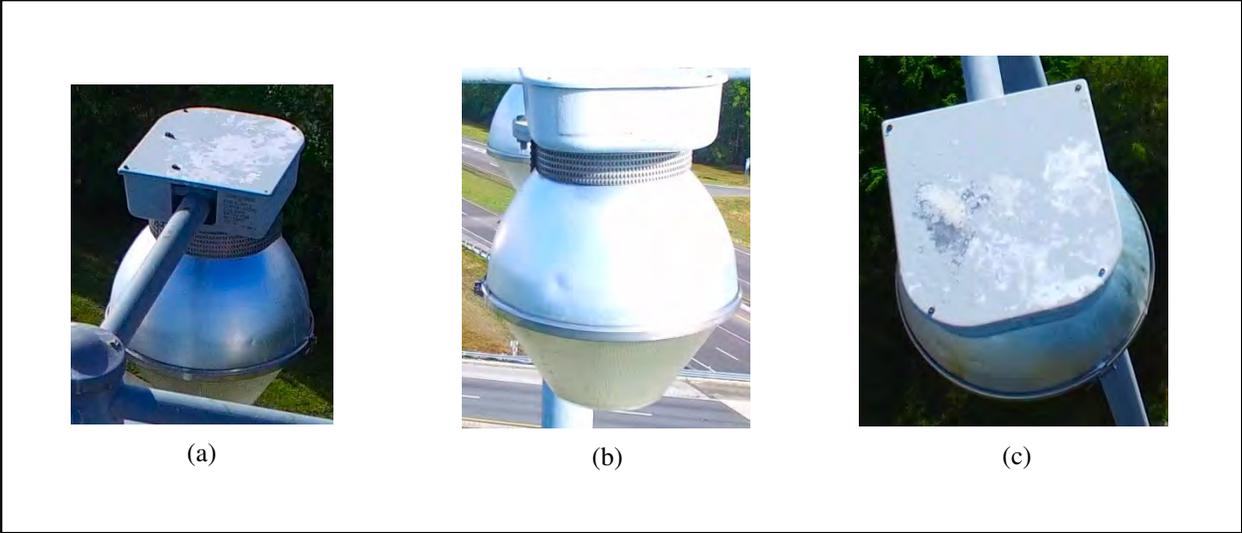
(a) Back (b) Bottom and (c) Top View of South Light Fixture
